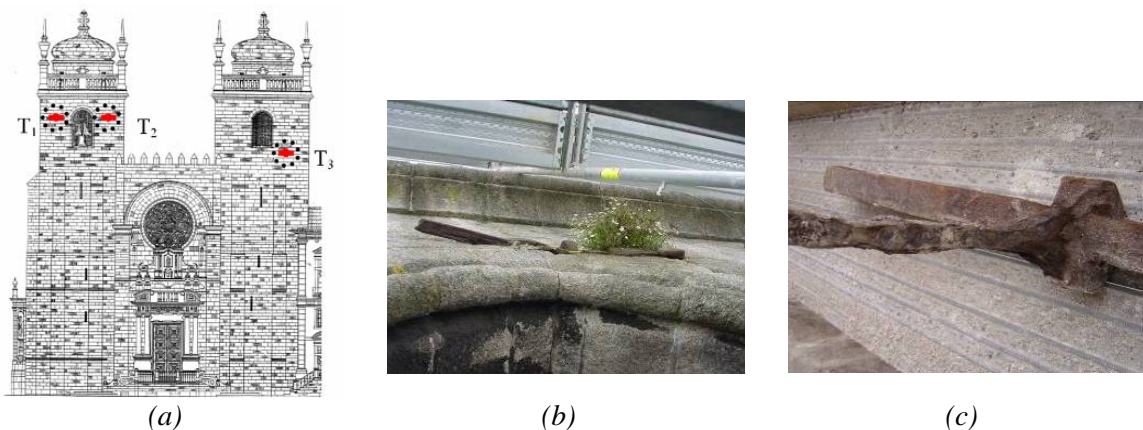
Ancient tower ties: (a) Deformed anchorage of tie T1 and (b) details of broken tie T3.
